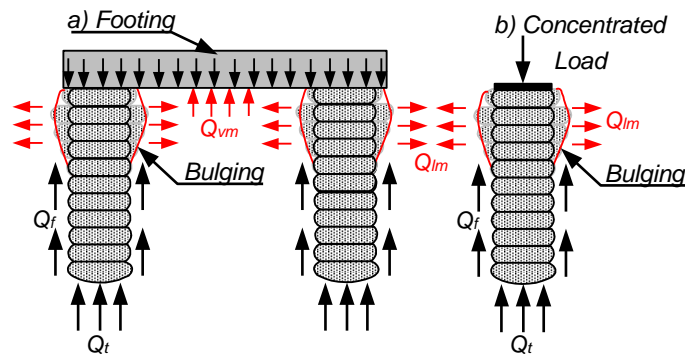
Stress distribution between aggregate pier and surrounding soil a) Group of piers under footing; b) Single pier
